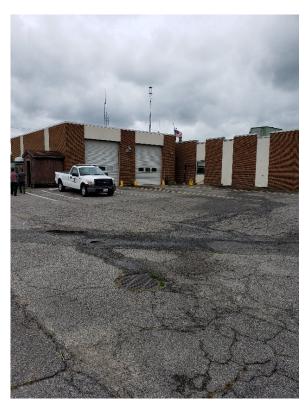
The southwestern side of the Fire Station (Building 100) View Direction: Facing northeast, June 19, 2019
